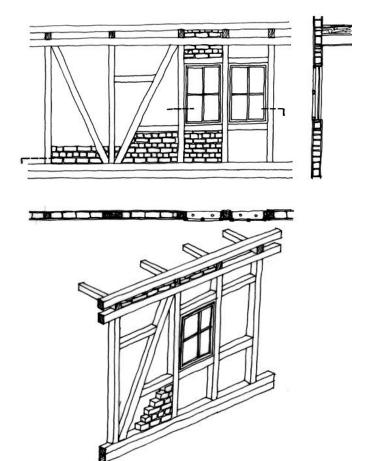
Oriental-style city house in Sarajevo. Floor wall with wooden skeleton ('bondruk system')
